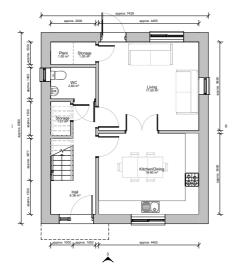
3-Bed Unit Ground Floor (not to scale)
